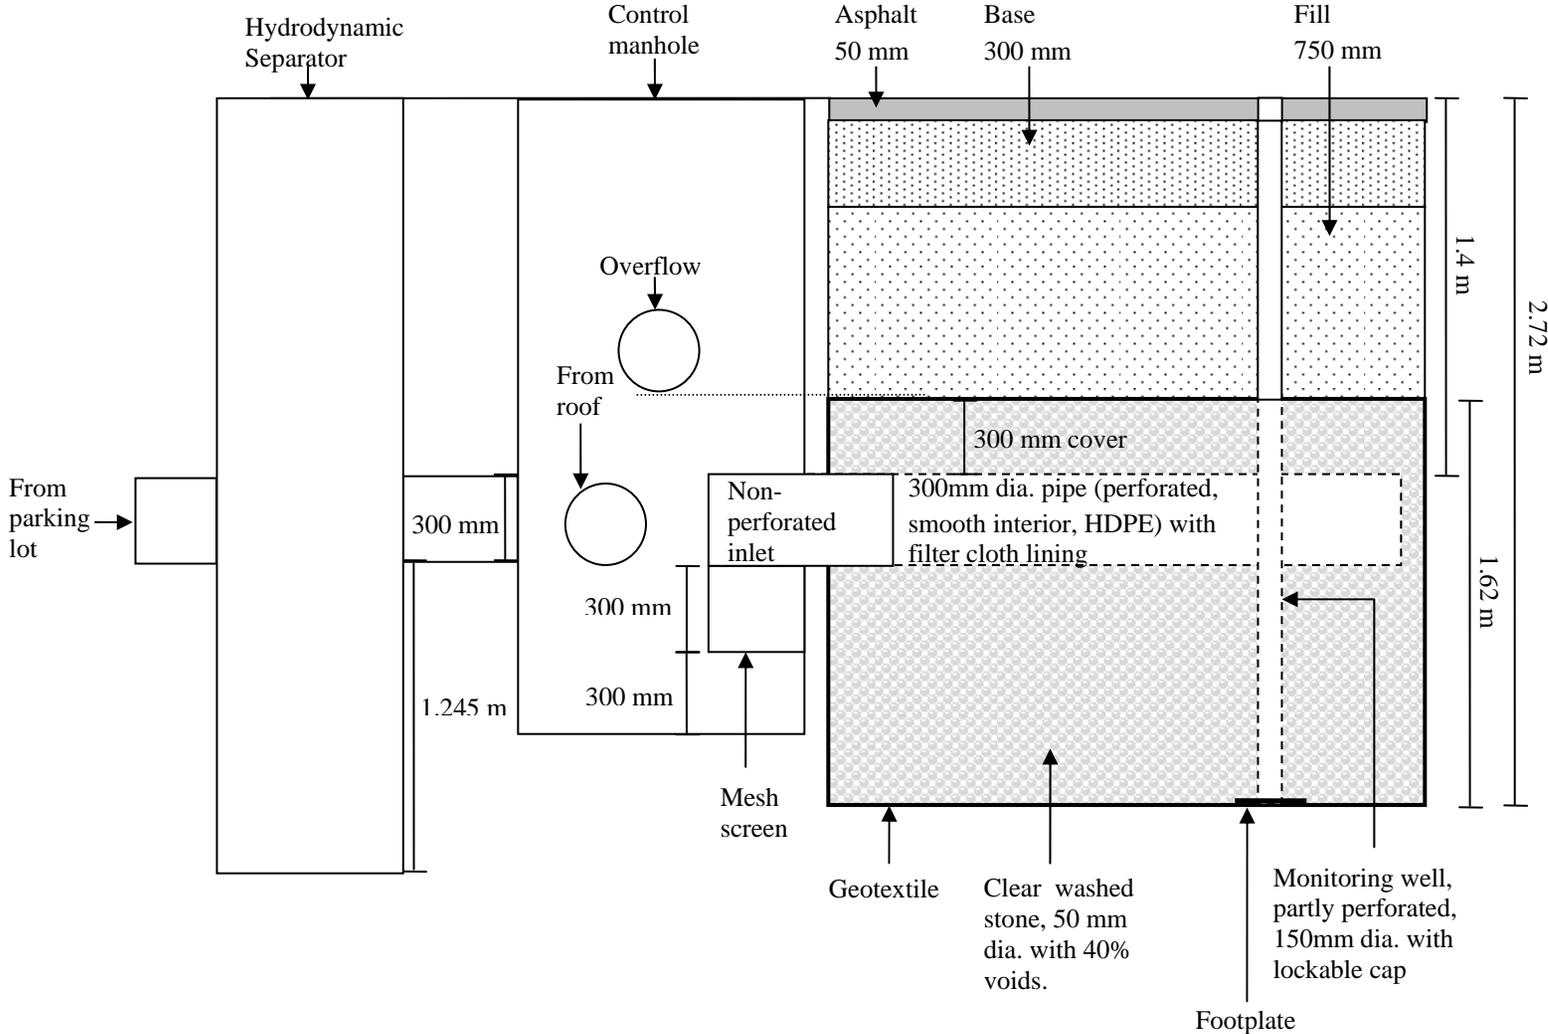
Cross section of the infiltration trench receiving road (1500 m²) and roof runoff (500 m²)
